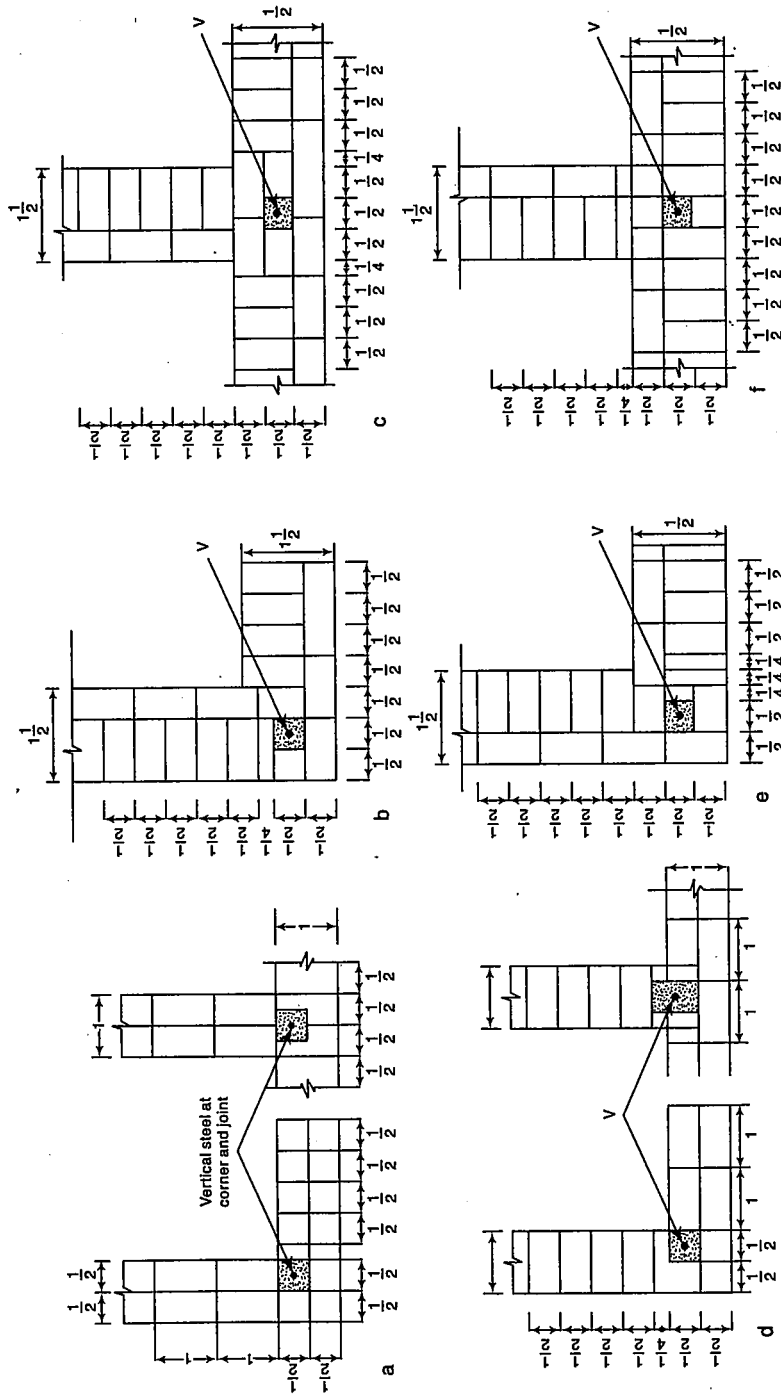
Typical details of providing vertical steel bars in brick masonry
